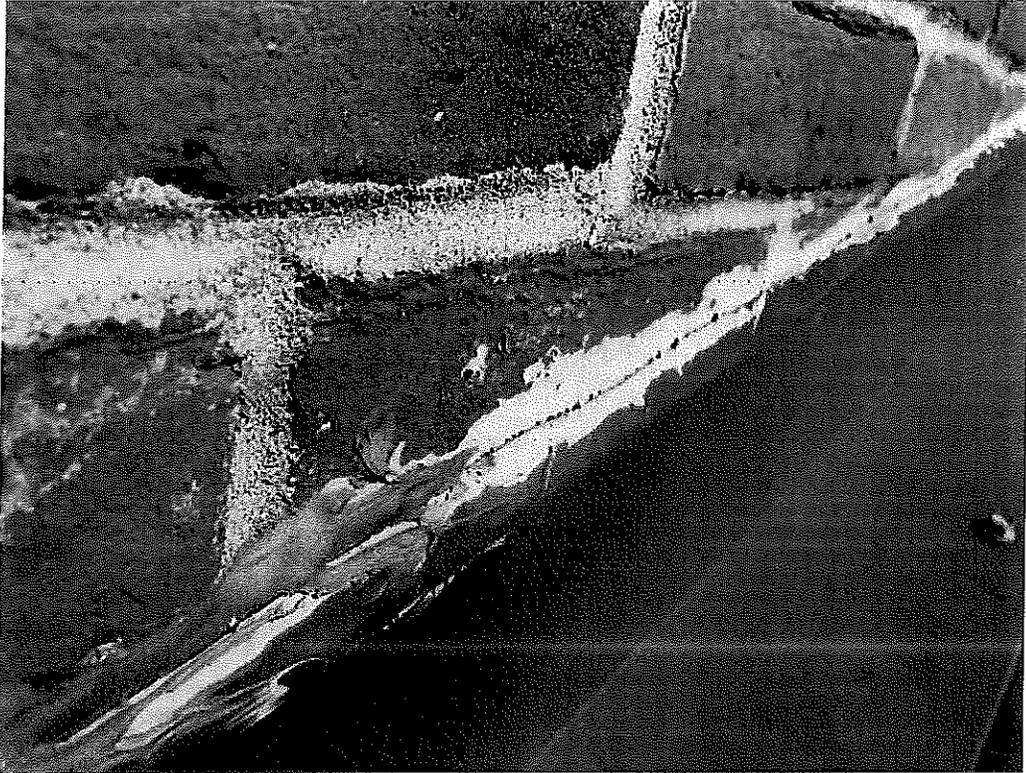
View of failed sealant at roof to brick wall transition flashing.
